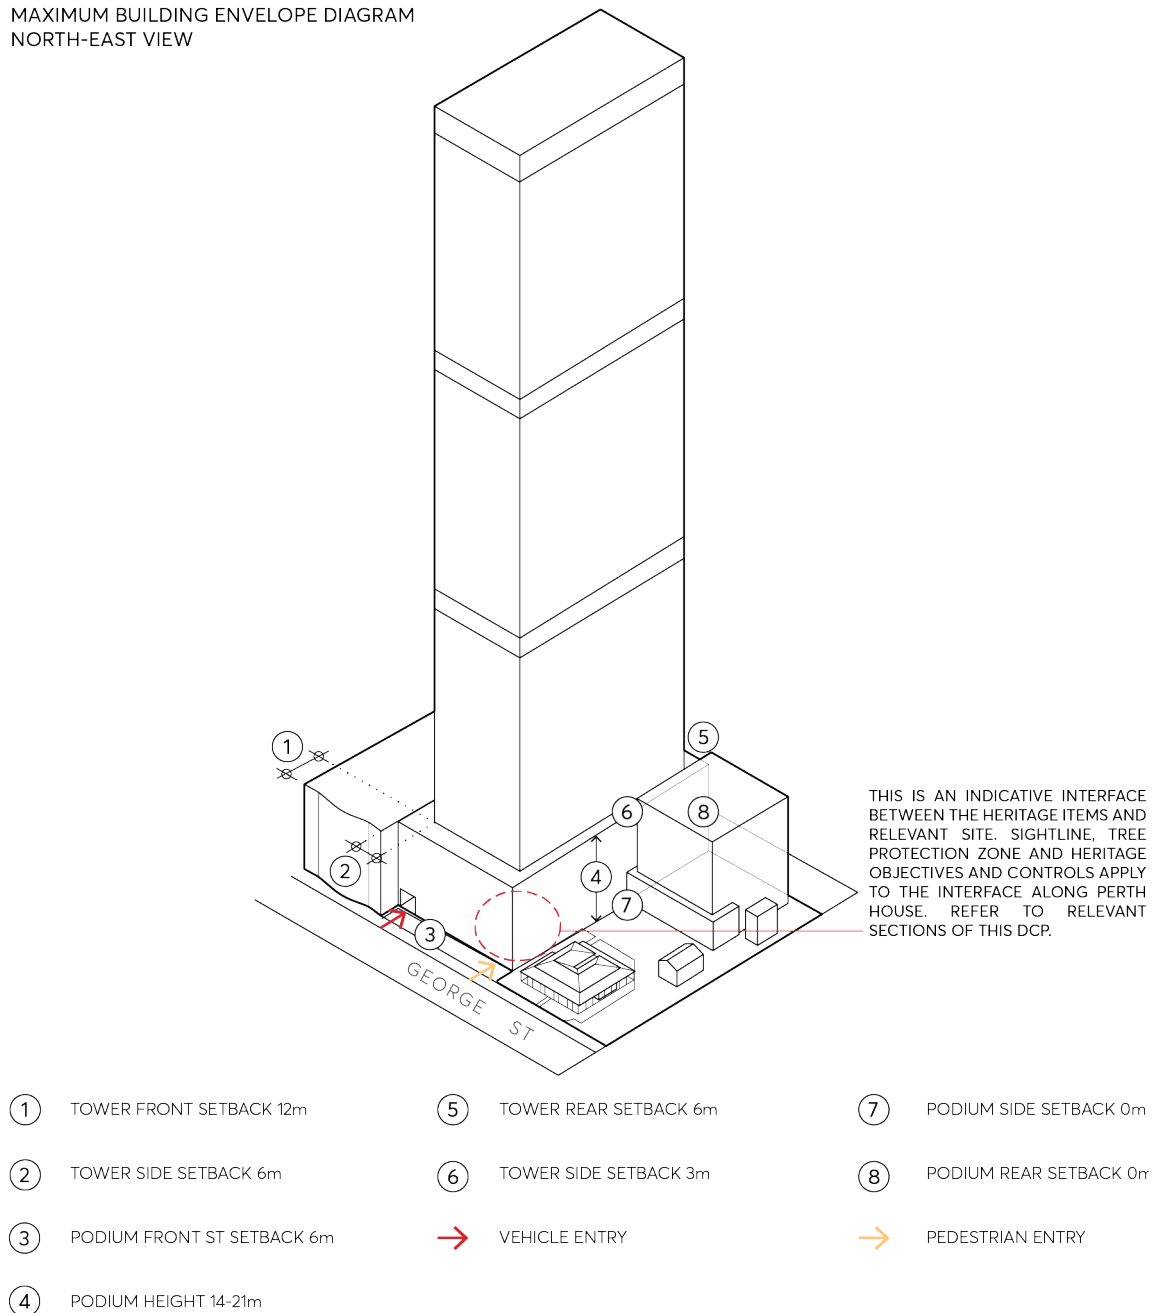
Maximum Building Envelope Diagram, view from North East (Source: Fender Katsalidis Architects)
